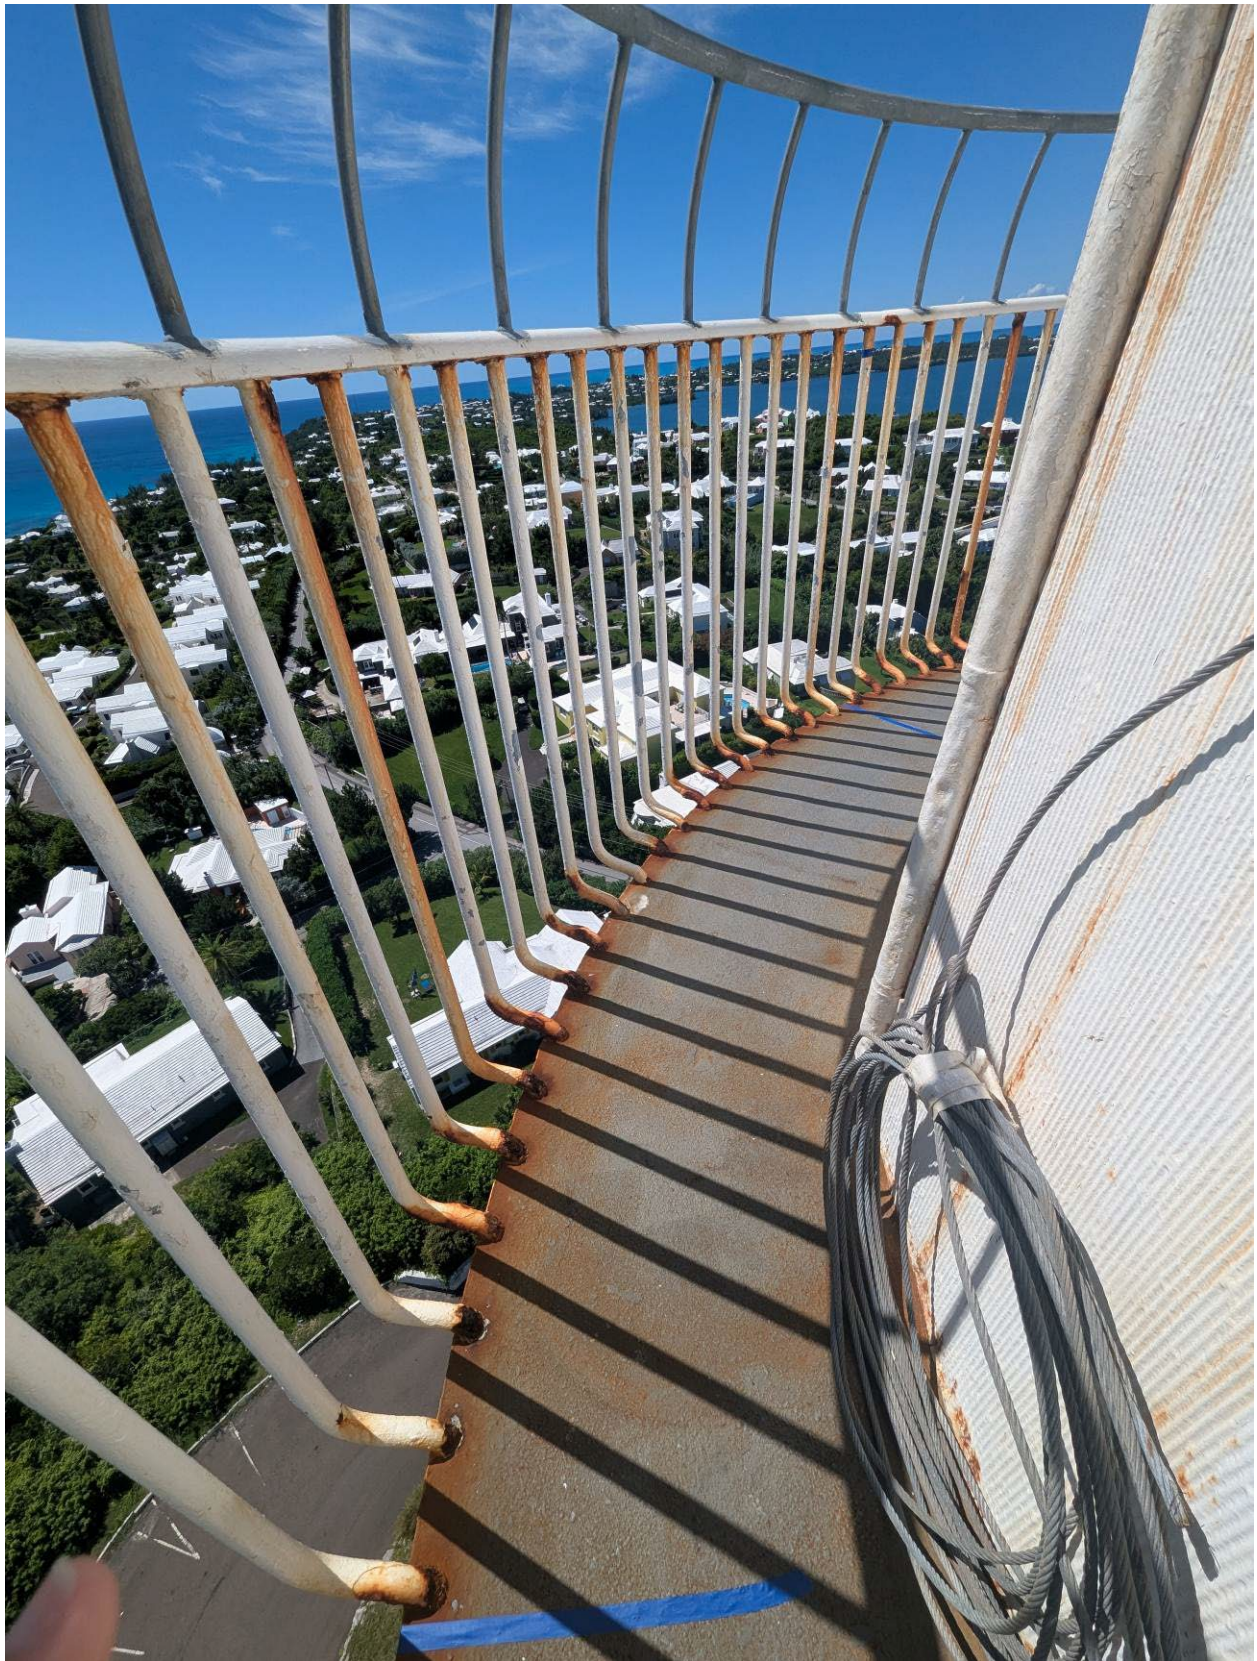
Lower gallery railings in Section 5 (Bars 081-100)
